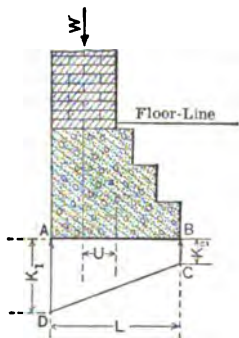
Offset Footing. Varying Pressure on Foundation-bed
